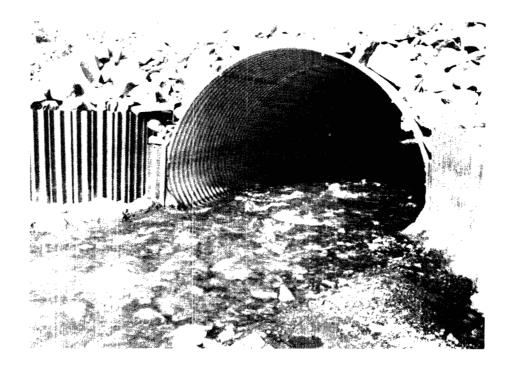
Stream width inside culvert approximately equal to stream width outside culvert, invert below natural stream bottom. Haines Road, mile post 120.
